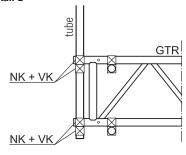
Version: Aluminium U-profile with half-couplers for decks
